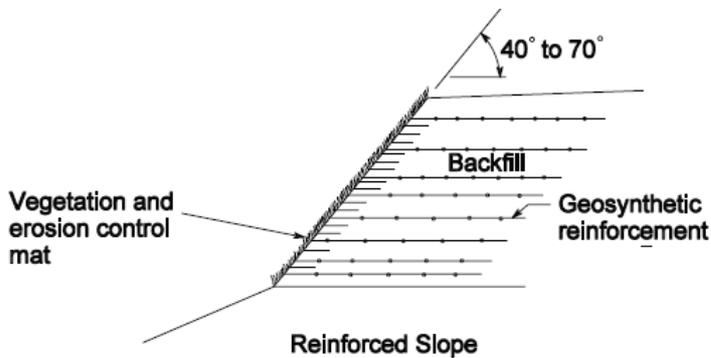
Reinforcement of slope using geosynthetics and slope protections with vegetations, typical example (source unknown)
